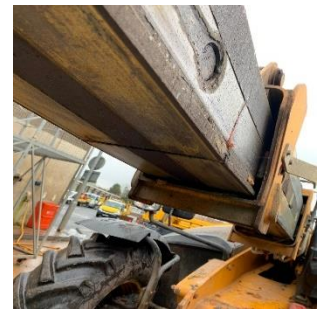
The JCB 535 Telescopic Handler (Loadall) Machine being used
